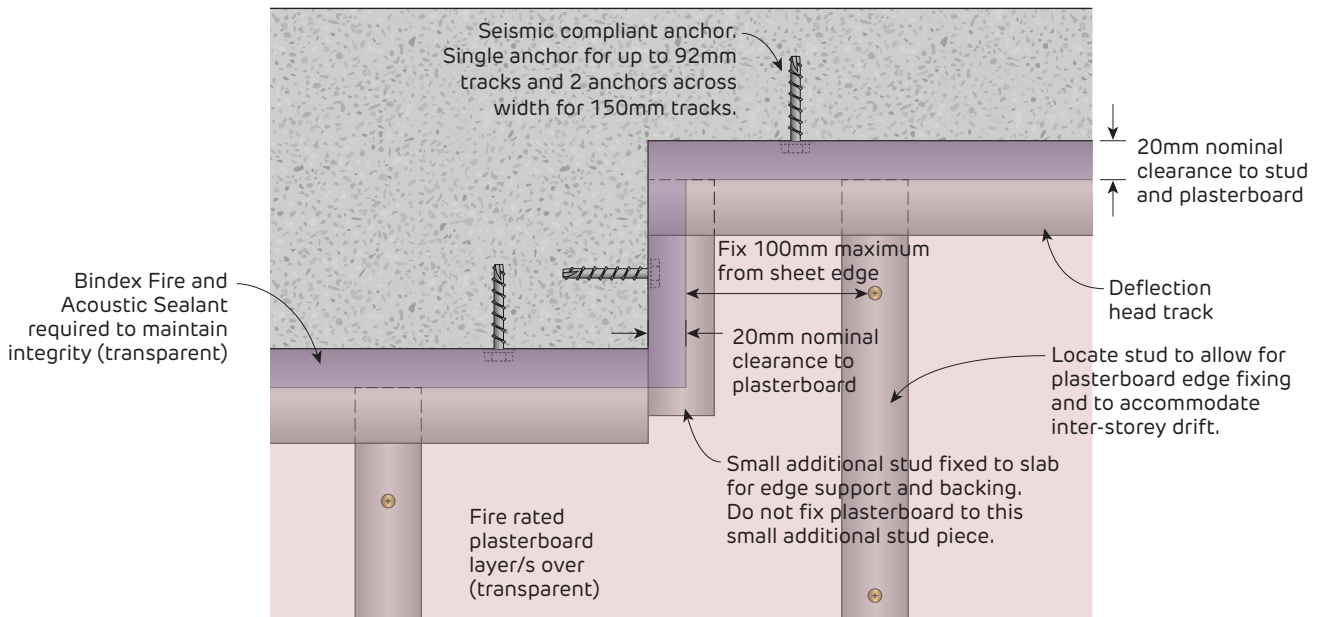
Step in Concrete Slab with 20mm allowance for Inter-Storey Drift
